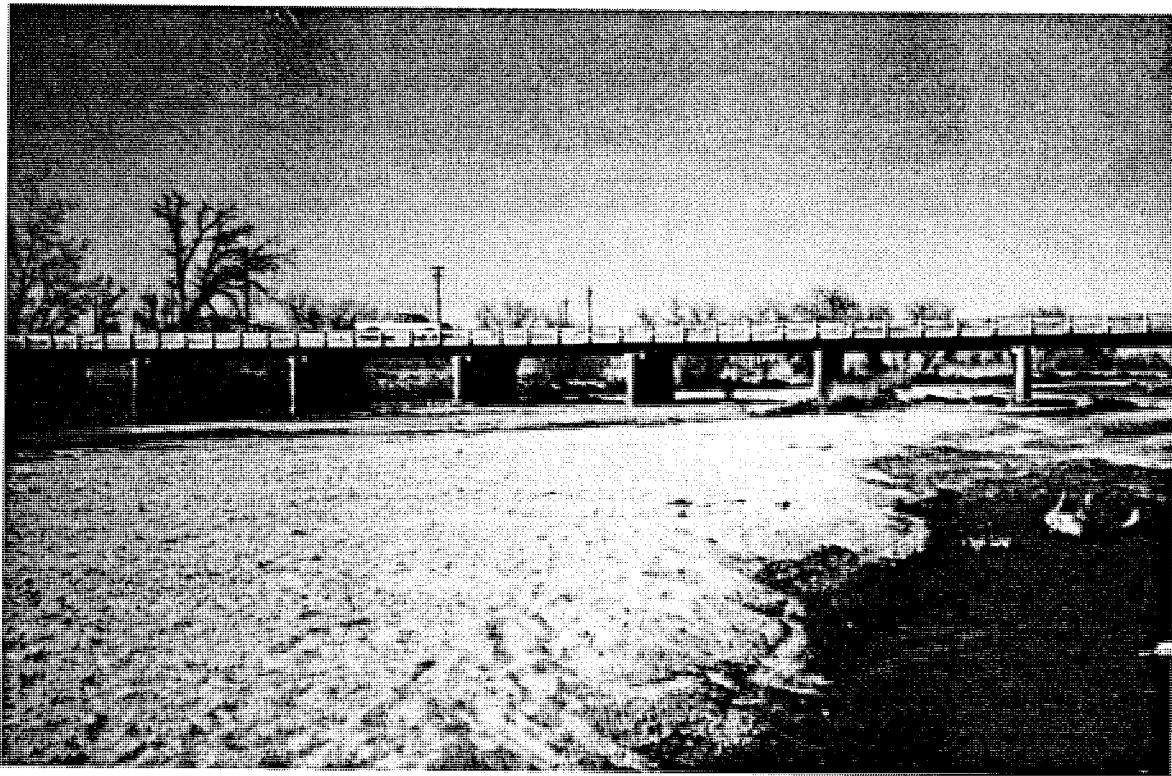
Photograph of Bridge on US 52, Structure No. D-17-I, over South Platte River, near Fort Lupton, Colorado.
